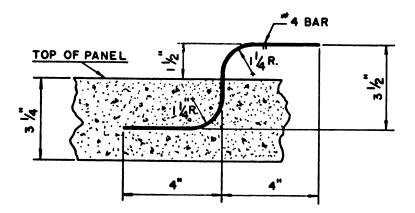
Z-bars used in selected panels to aid in providing structural connection between panel and cast-in-place deck. (From Reference 3.)
